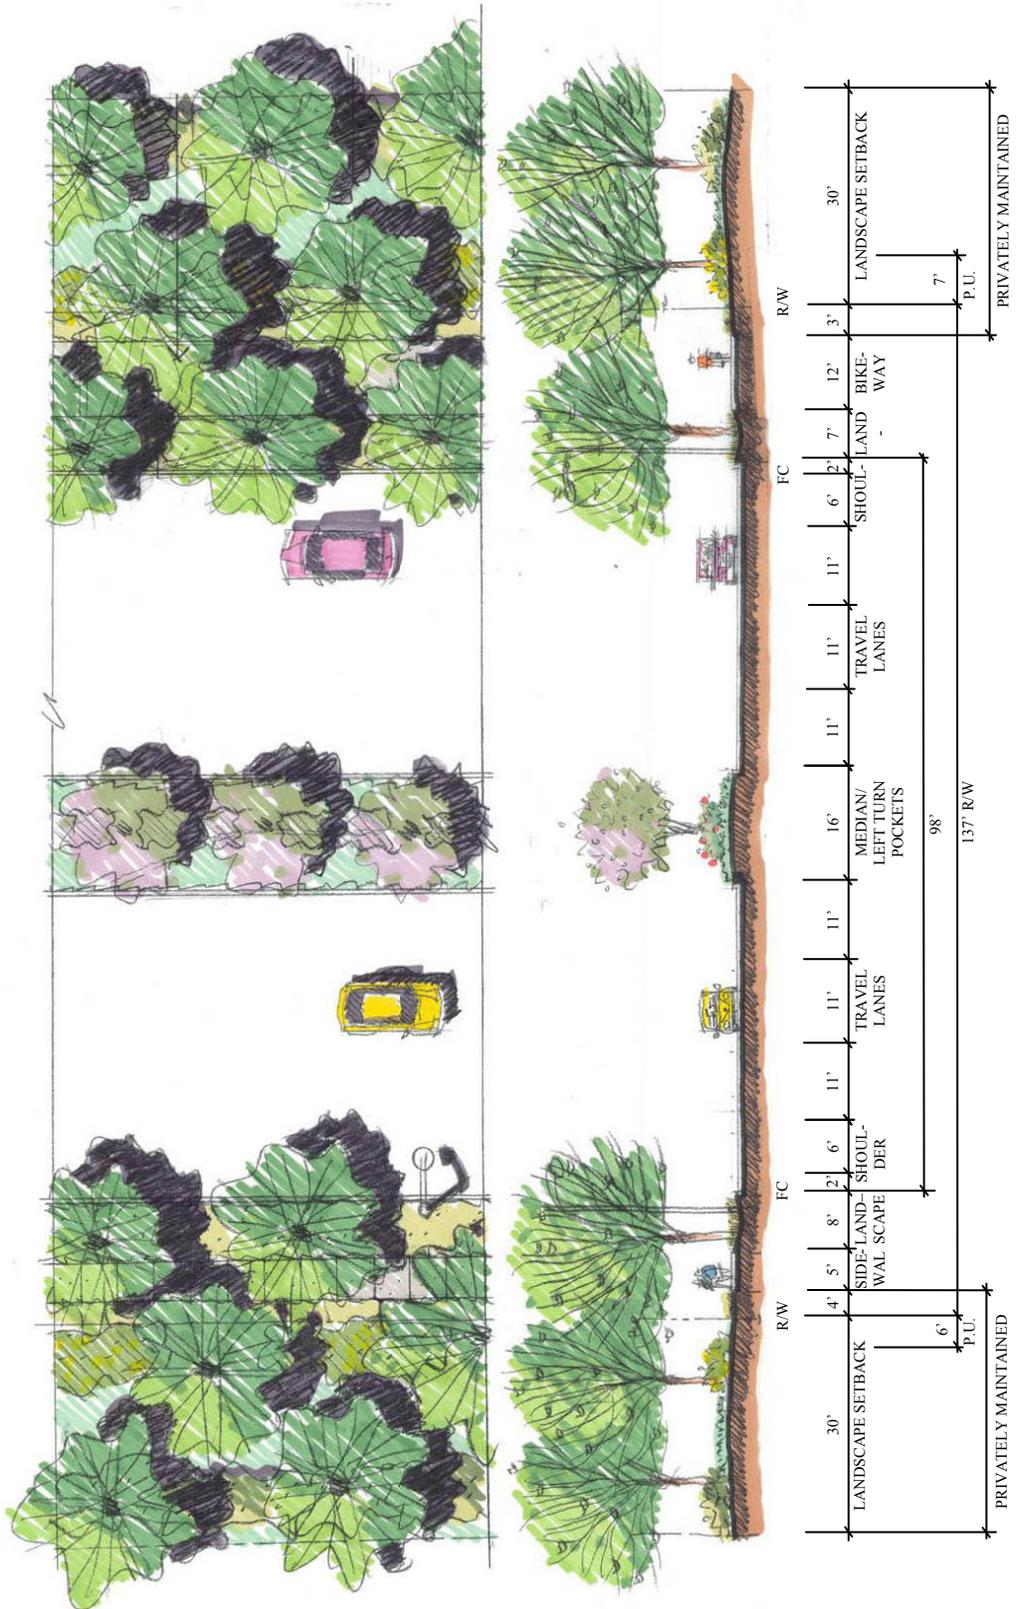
, Conceptual 6-Lane Parkway, Section B-B
